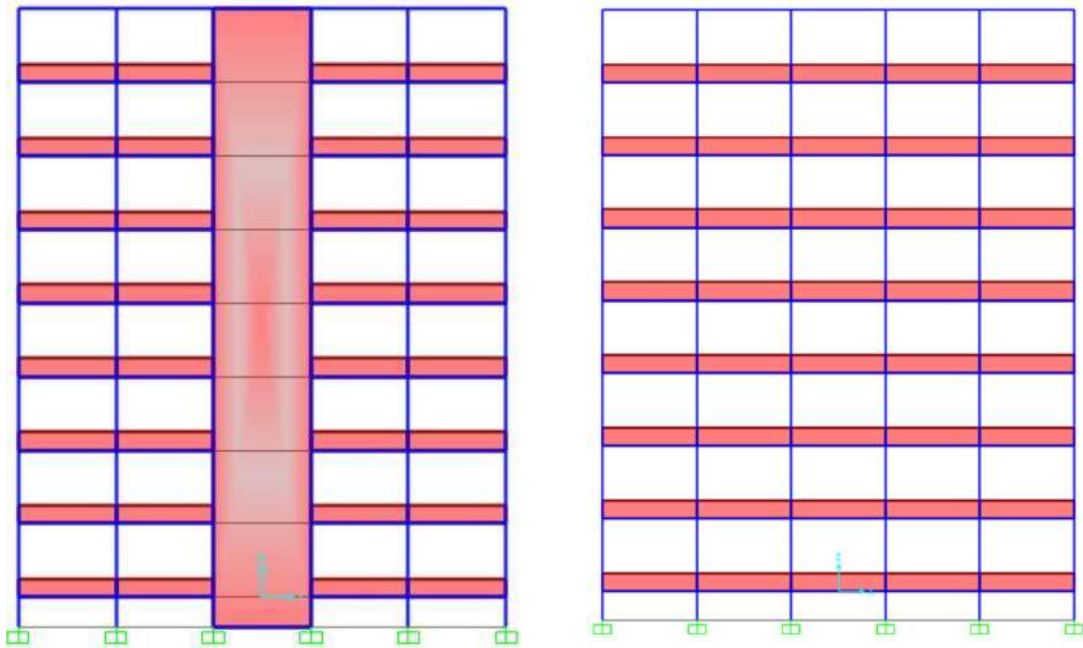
Elevation of 25% Partially in-filled frame with shear wall
